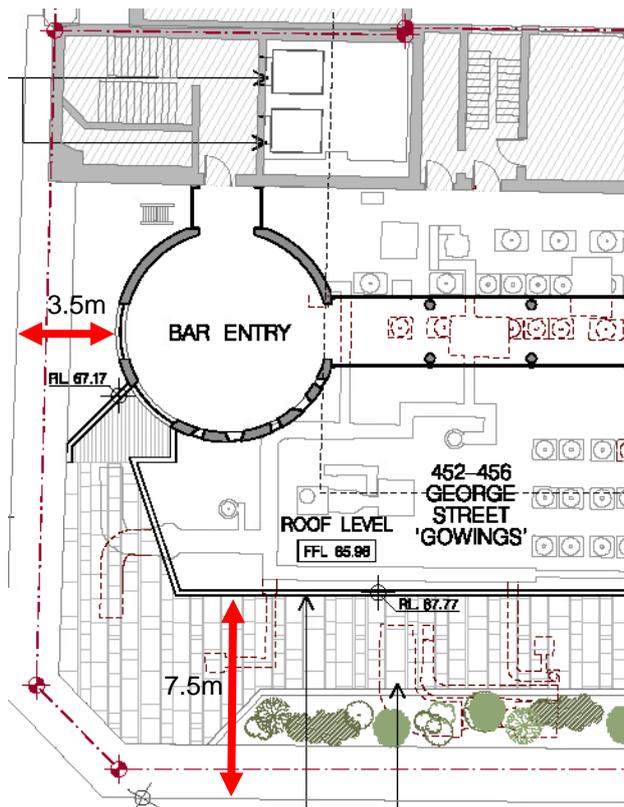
Extract of the Level 12 floor plan drawing, with setback distances noted
